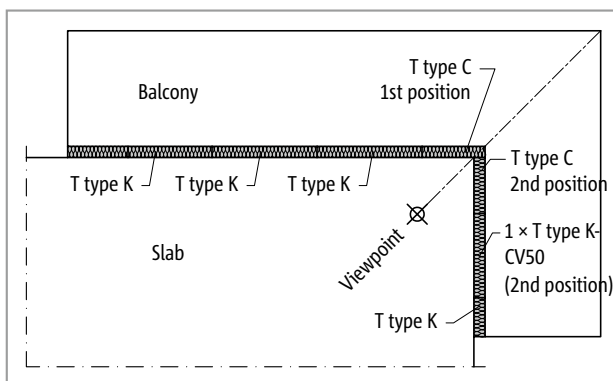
Schöck Isokorb® T type C: Balcony with outside corner freely cantilevered
